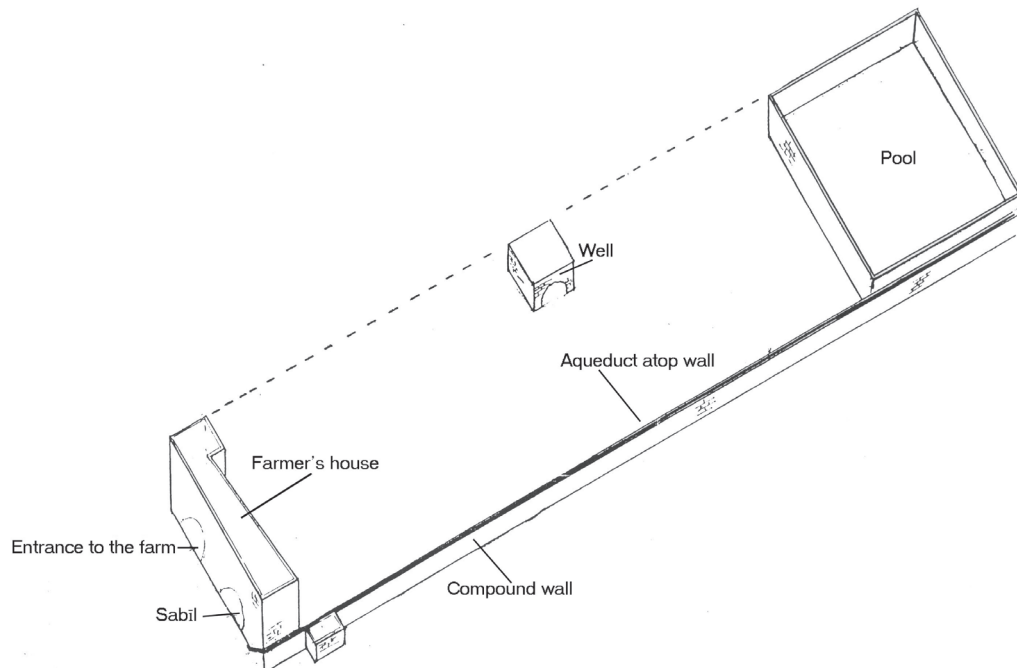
General isometric plan of country house at Bāyarāt Enachi, Azor (Sasson 2002:118).
